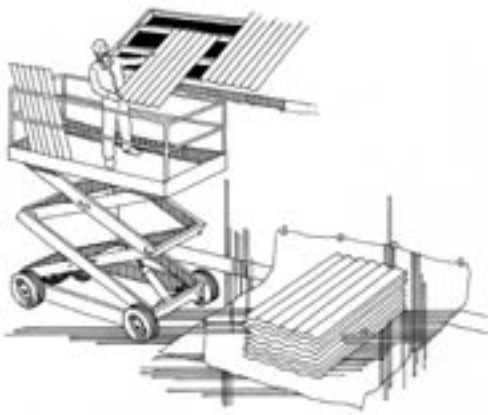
removing asbestos-cement sheeting using an elevating work platform and stacking it on polyethylene sheeting
